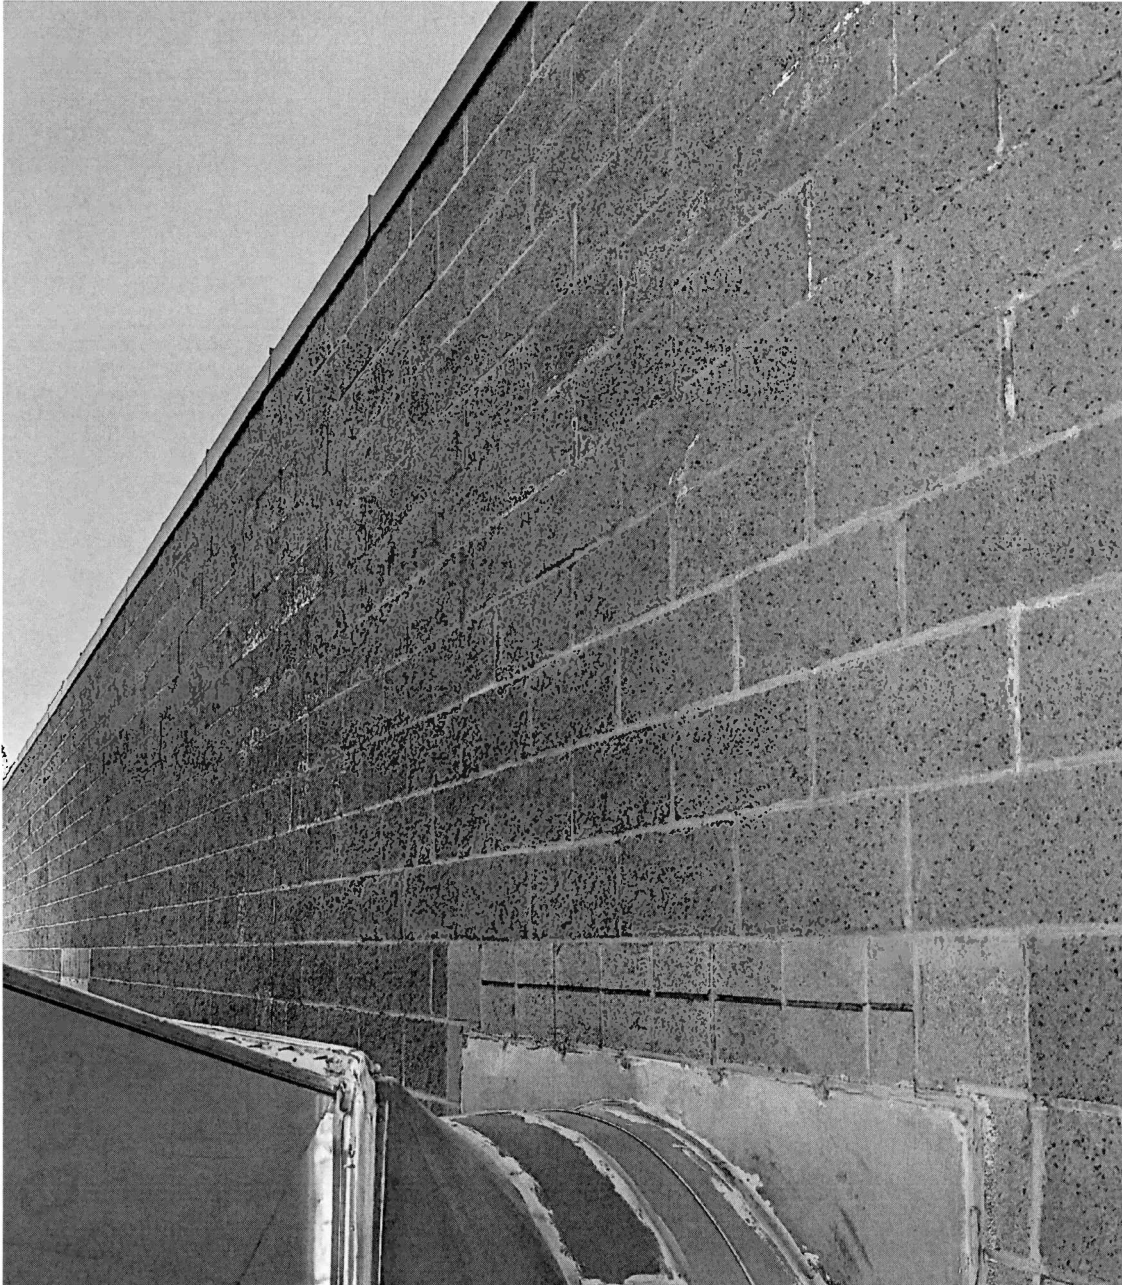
North wall illustrating white efflorescence and minor damage.
